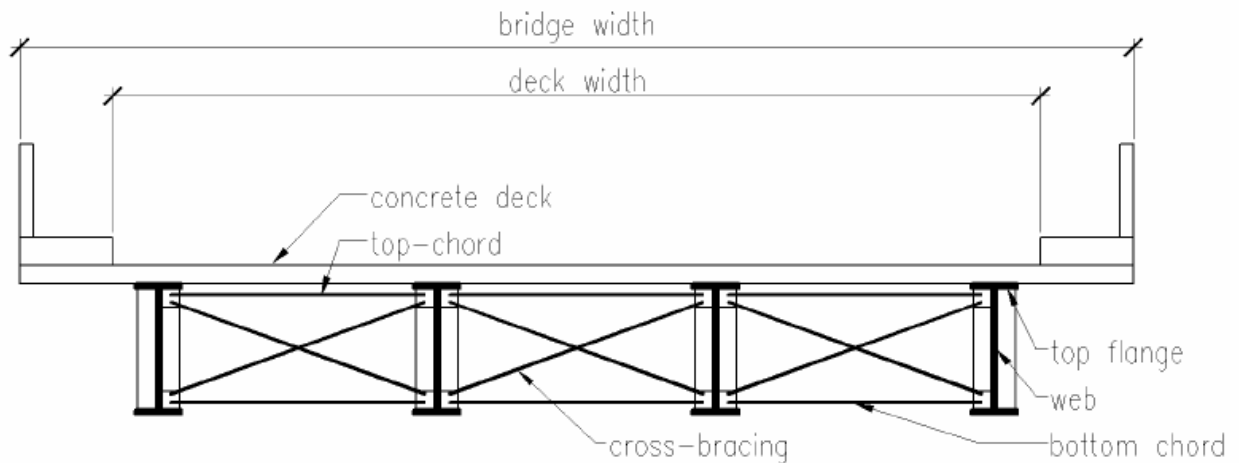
Typical Cross Section of Concrete Deck I-Girder Bridge
